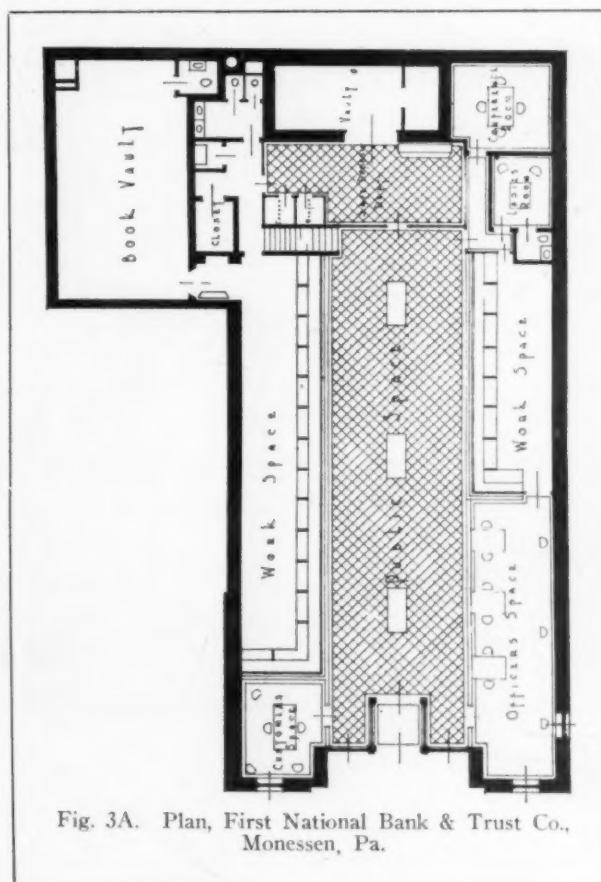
A. Plan, First National Bank & Trust Co., Monessen, Pa.
